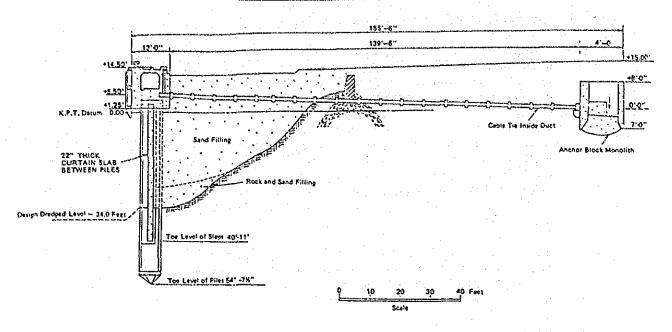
A Possible Conversion Plan (East Wharf)
